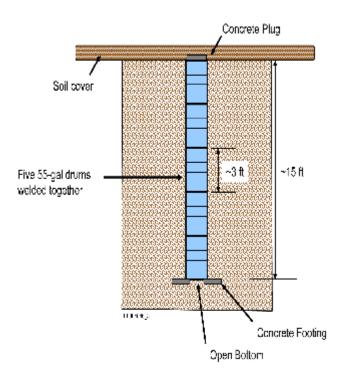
Typical 618-10 and 618-11 Site Vertical Pipe Unit
